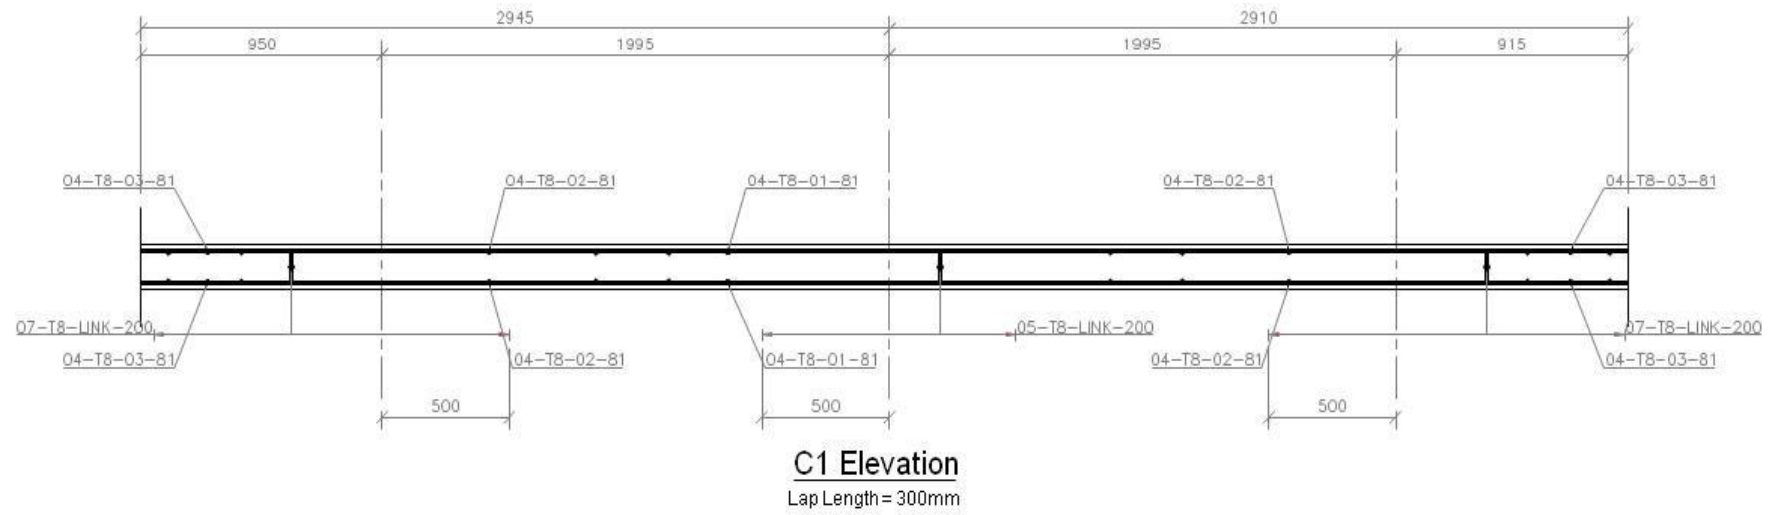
Elevation of reinforcement detailing of sample C1.
